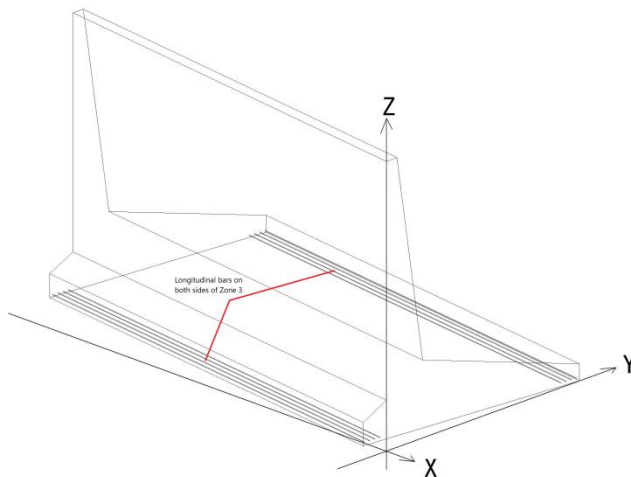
Demonstration of Longitudinal Reinforcement Structure of Retaining Wall
